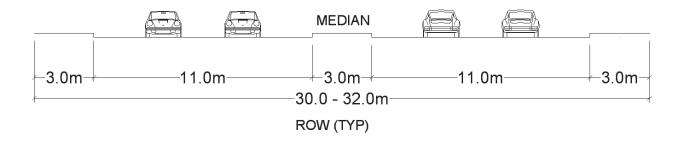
Schematic Don Valley Parkway Cross-Section (facing north, south of Eastern Avenue)
